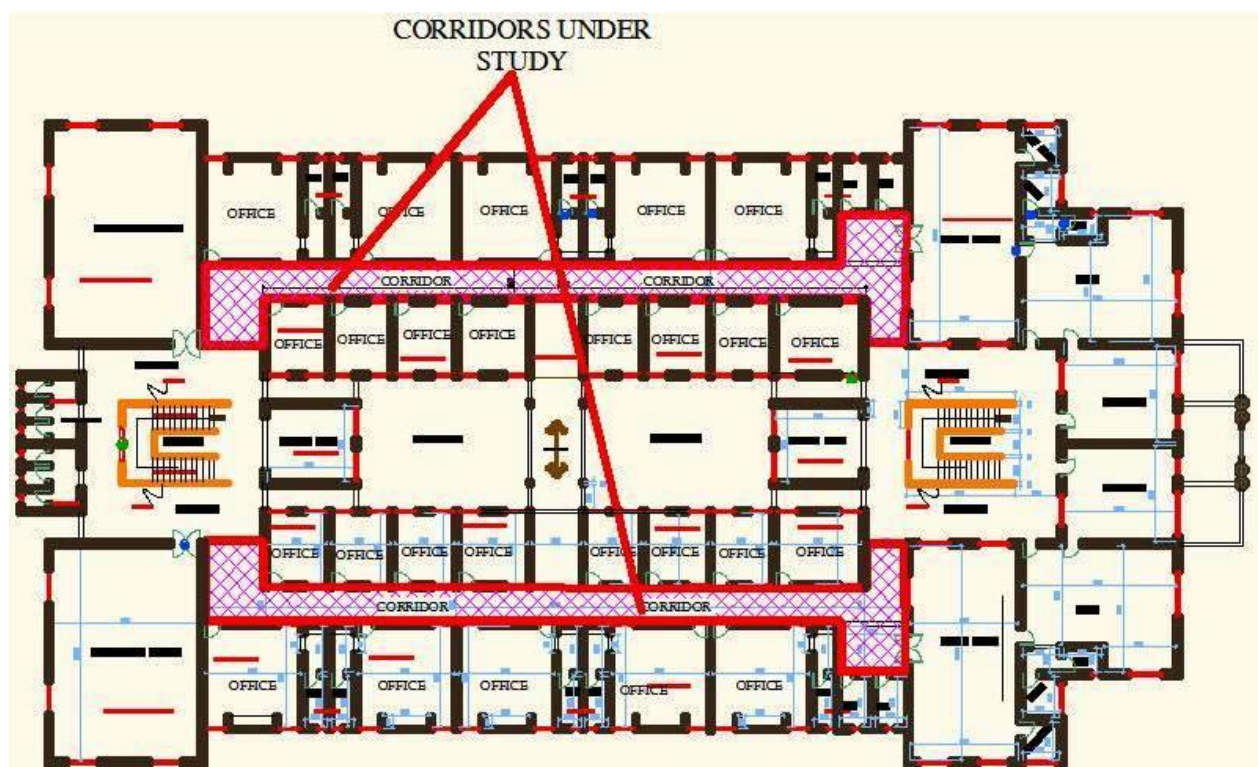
First floor plan of Survey & Building Departments showing corridors under study
